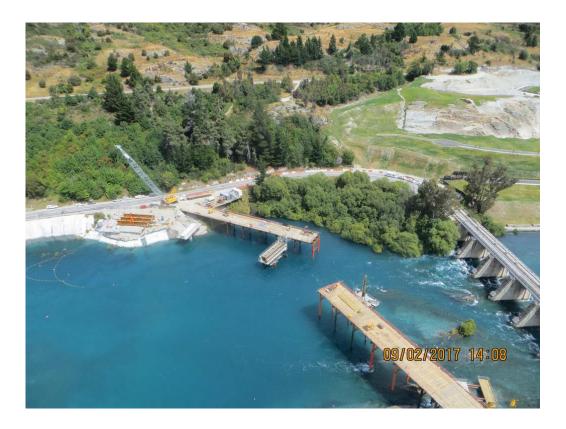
Photograph of temporary platforms - Kawarau Bridge
